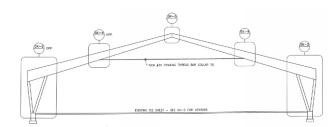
Excerpt from RJC Structural Assessment Report Cross-section showing areas to be modified.
